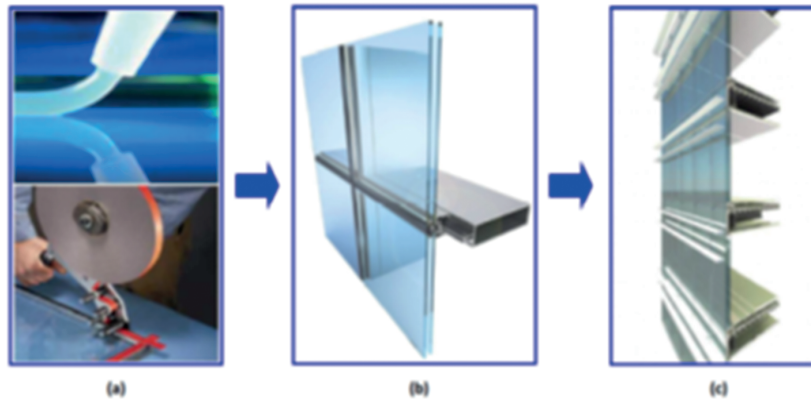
Details of modular curtain wall manufacture and installation through structural glazing approach utilizing adhesive bonding of vision (glass) or solid decorative cladding panels to the framing system (mechanically attached to the building structural frame at each floor level): a) application of silicone adhesive or high-strength self-adhesive tape to the cladding panel; b) details of attachment of façade modular cladding panels to curtain wall framing by elastomeric adhesive; c) bonded cladding panels assembled in curtain wall system through aluminium framing mechanically fixed to building flooring panels [11]
